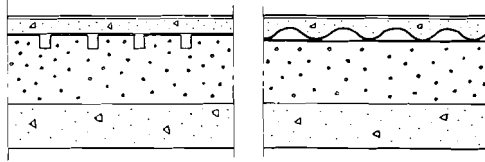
Light-weight concrete poured directly on the roof construction with small ducts or grooves for ventilation, or with corrugated sheets forming the ducts.
